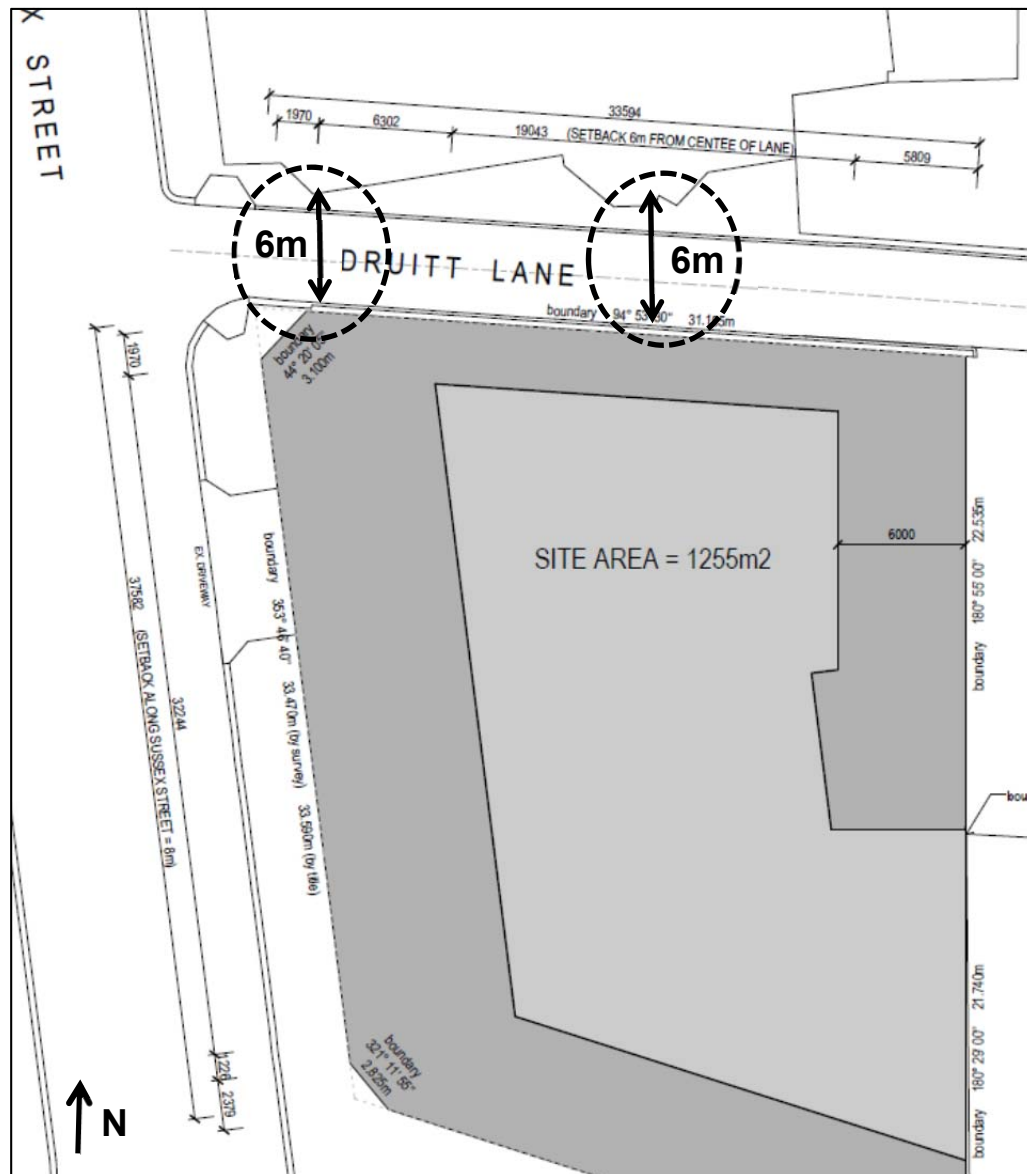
Locations where separation between proposed podium (hotel use) and adjacent residential building across lane is 6 metres
